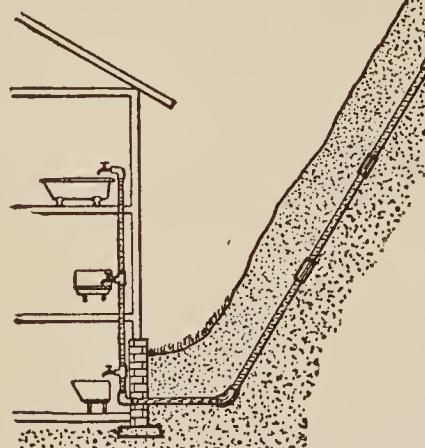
The Arrangement of Piping Used to Siphon Water Over a Hill.
